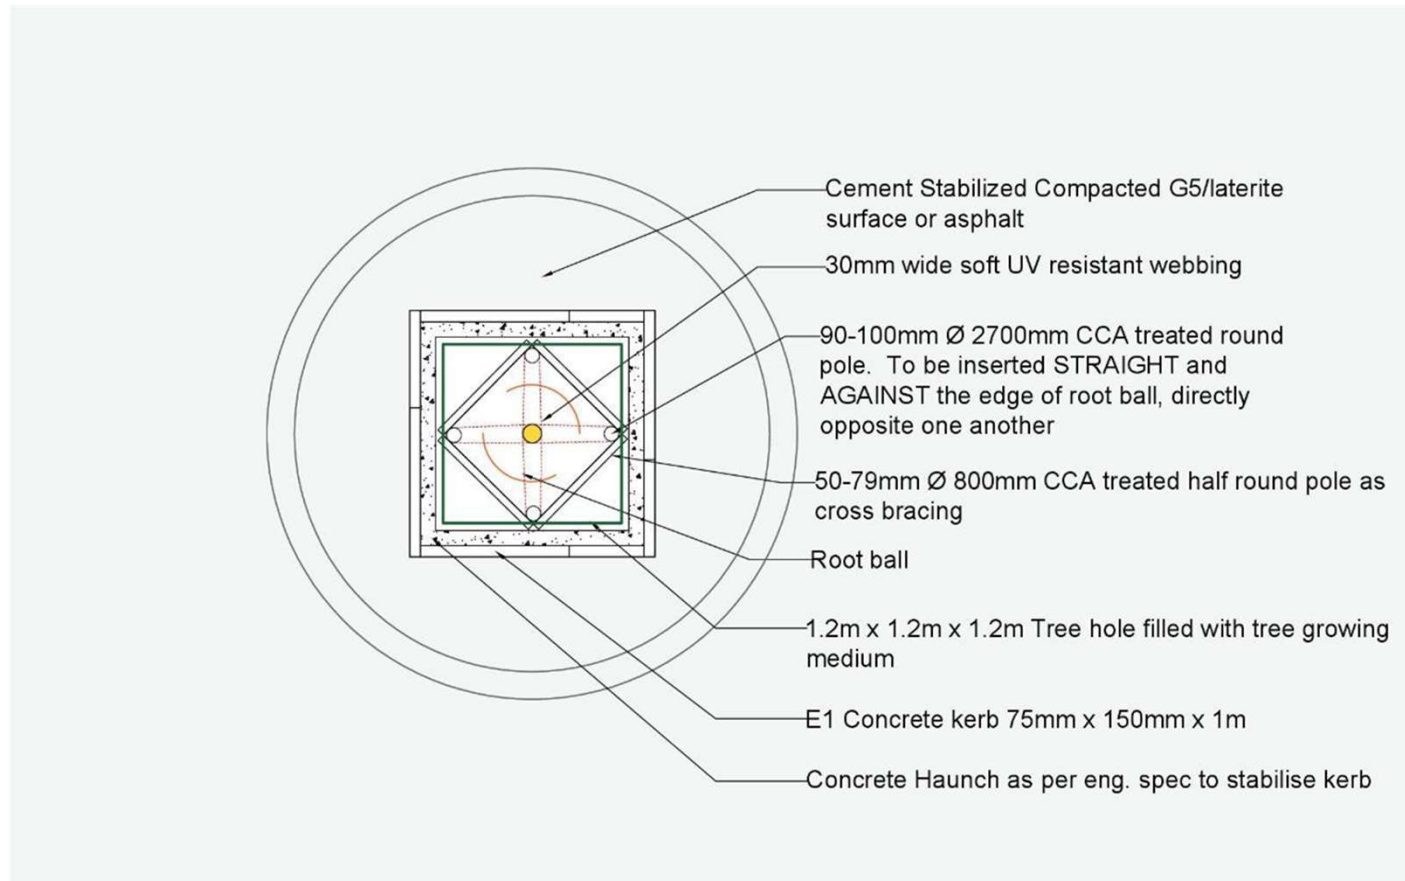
Hardscape Tree Detail Plan (Viridian Consulting, 2024)
